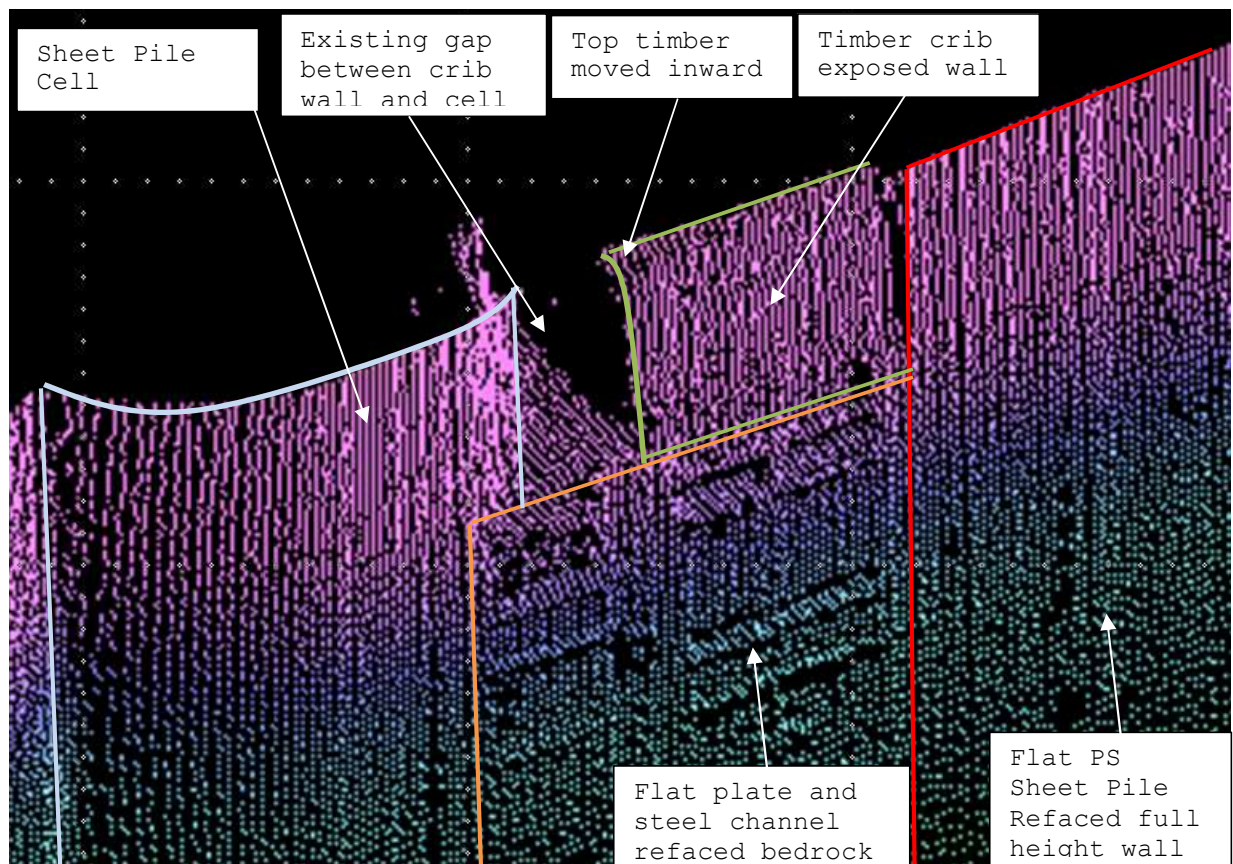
Multi-beam sonar survey – Rotation of crib wall above 1994 repair area and rolled top crib visible
